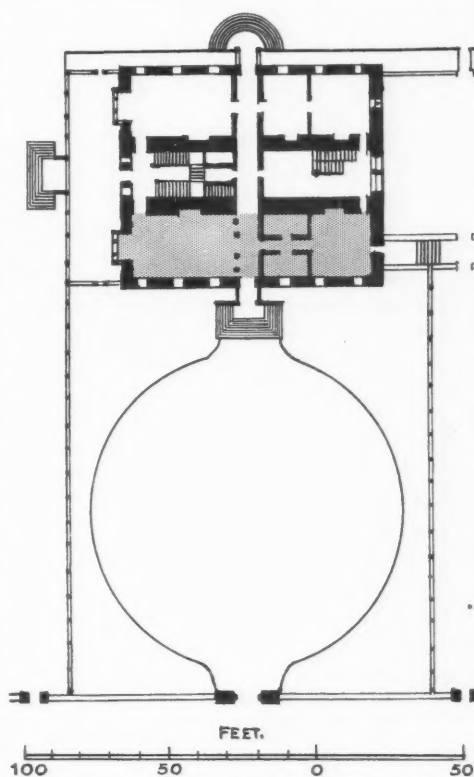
The ground-floor plan of Thorpe Hall. From Hakewell's drawing.
